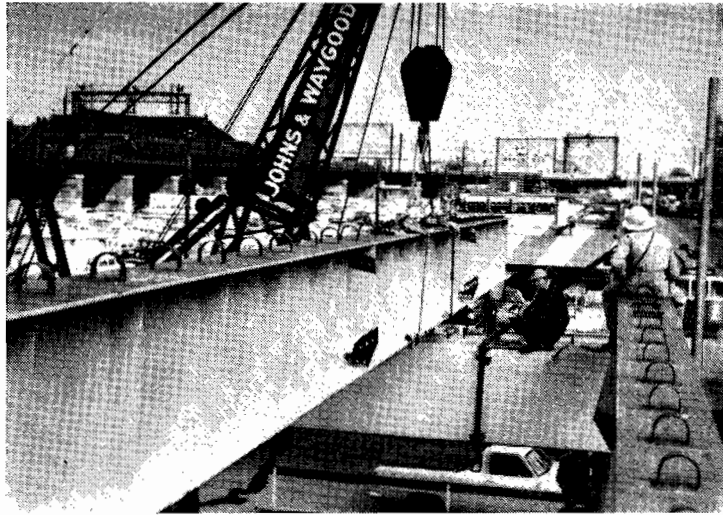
Seating a steel girder on the Flinders Street Overpass.
